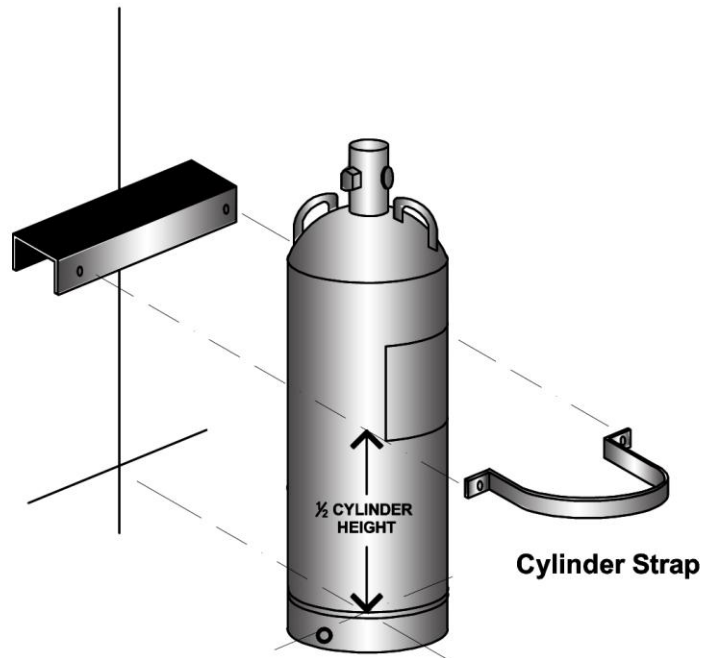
Floor and Wall Brackets for 1200lb Cylinders
